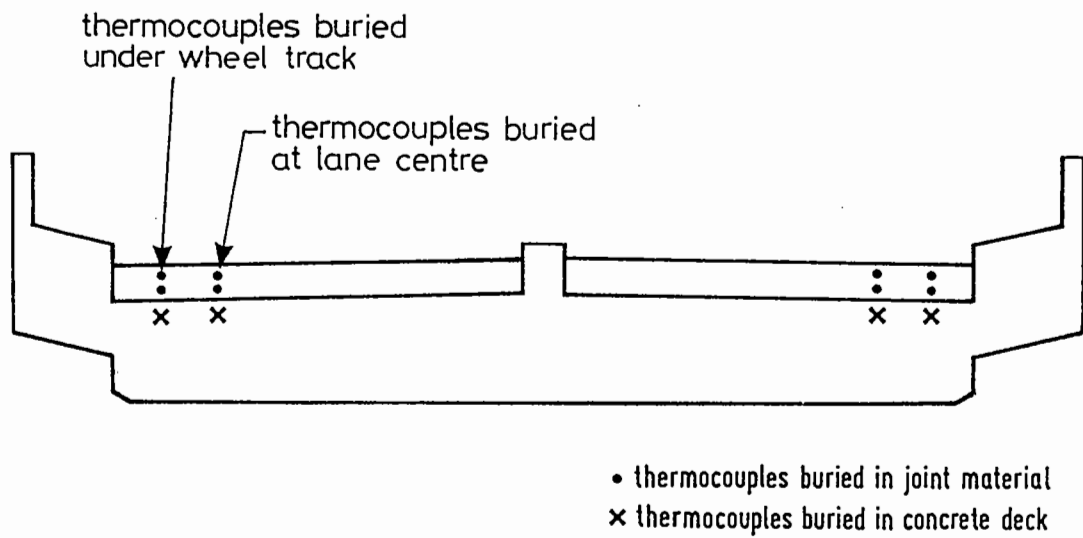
CROSS-SECTION OF BRIDGE DECK
